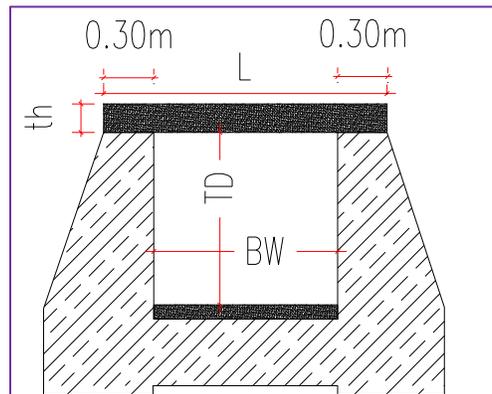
Typical Cross Section of the main canal at Foot Path Crossing
